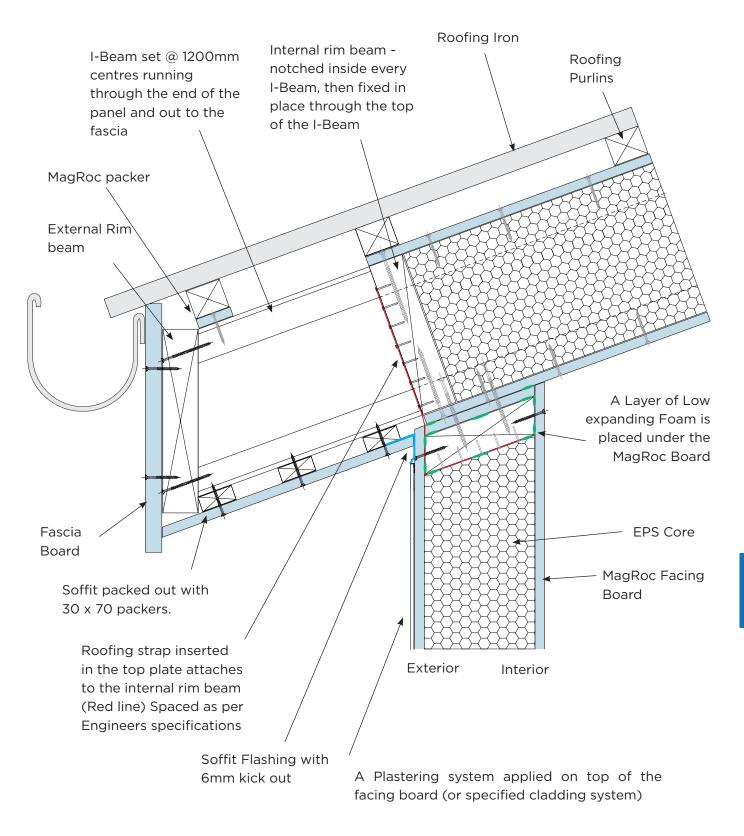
MagRoc 'Typical' MagRoof top to Angled Soffit 91' - 115'
